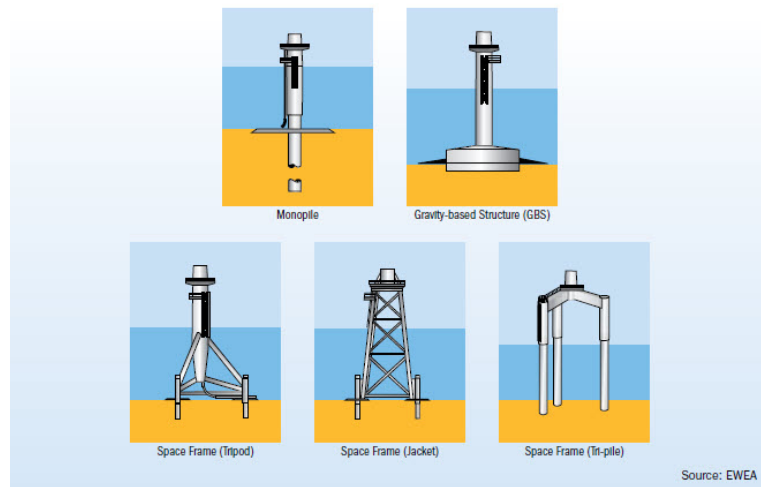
Typical fixed offshore foundations (Source: EWEA )
